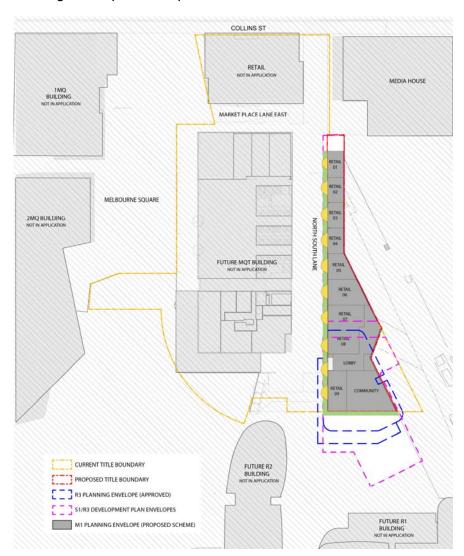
Diagram depicting layout of the proposed M1 building, from Planning Application No. TP-2019-1020
